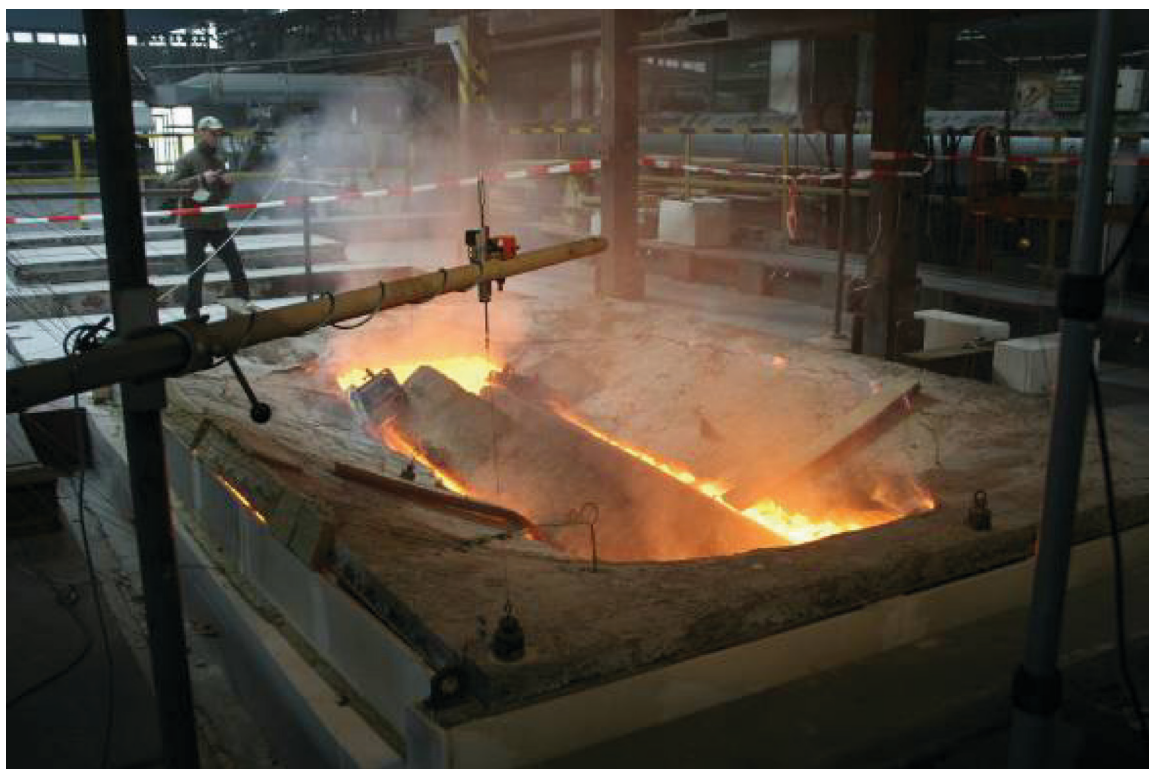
Collapsed composite slab assembly during fire test. (Photograph courtesy of Professor Frantisek Wald)
